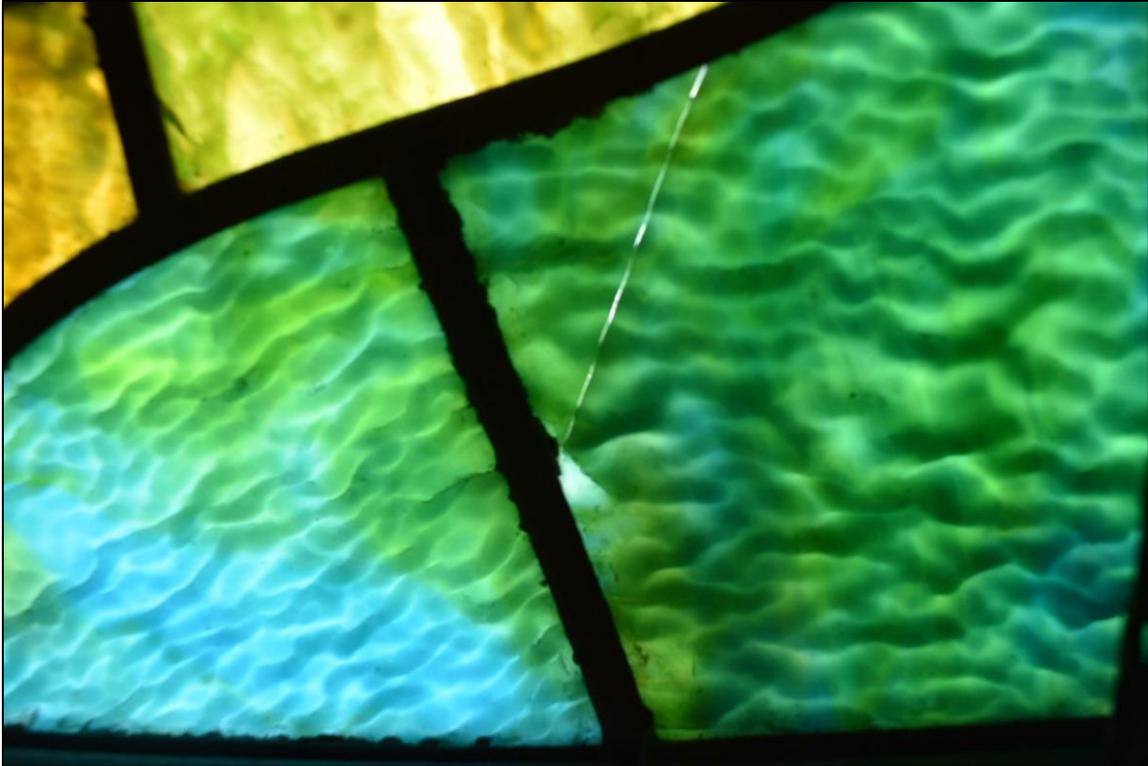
Slight crack (Panel 1) in window (W8).
